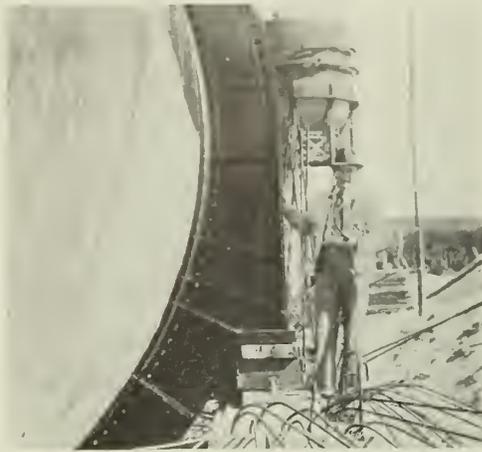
Foot and Rocker Bearing, Supporting Ring Girder.
